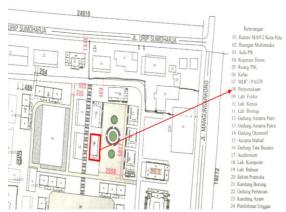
b. Floor Plan of MAN 2 Library in Kota Palu
